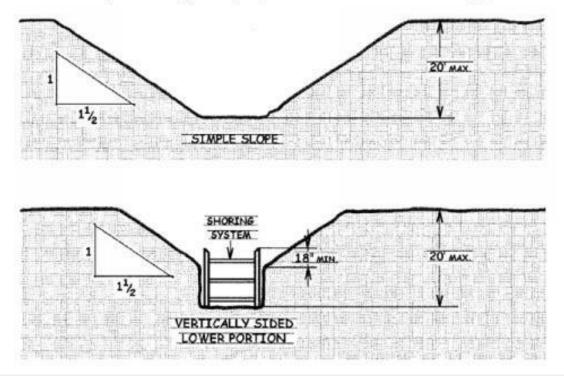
| Benching & Sloping For Excavations Made in Type "C" Soil
